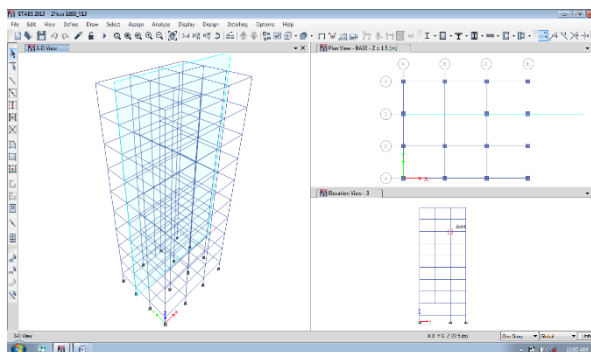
Plan and Elevation of 10 storied irregular frame considered for ION
